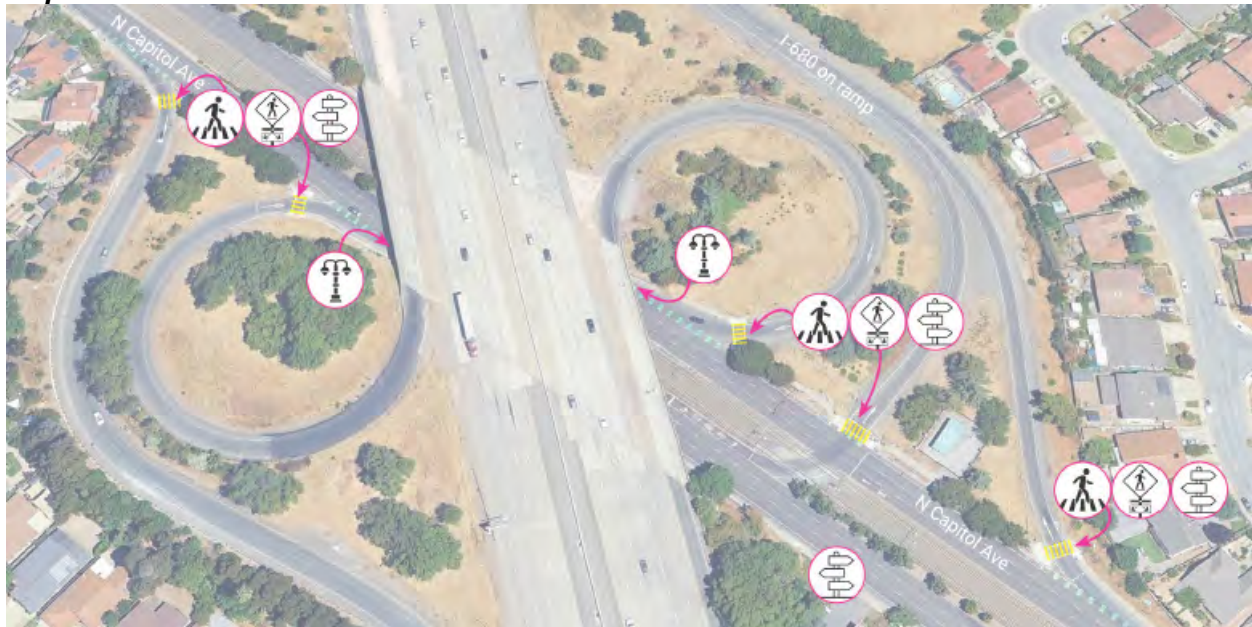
and 40 illustrate the proposed access improvements at the North Capitol Avenue and Hostetter Road intersections with I-680 on/off ramps.
